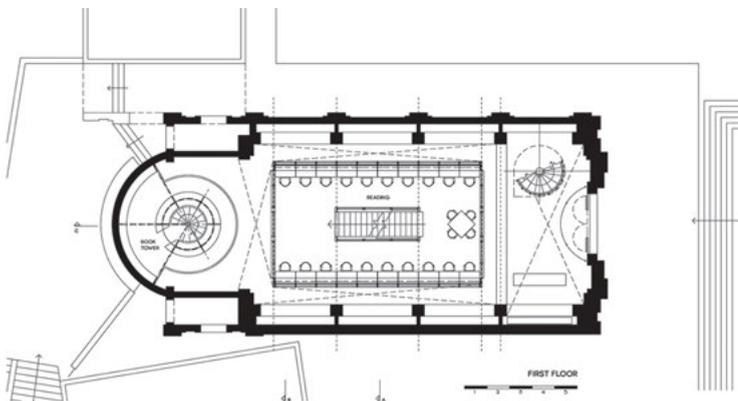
Plan of second level. © Carlos Campuzano Arquitectos.
